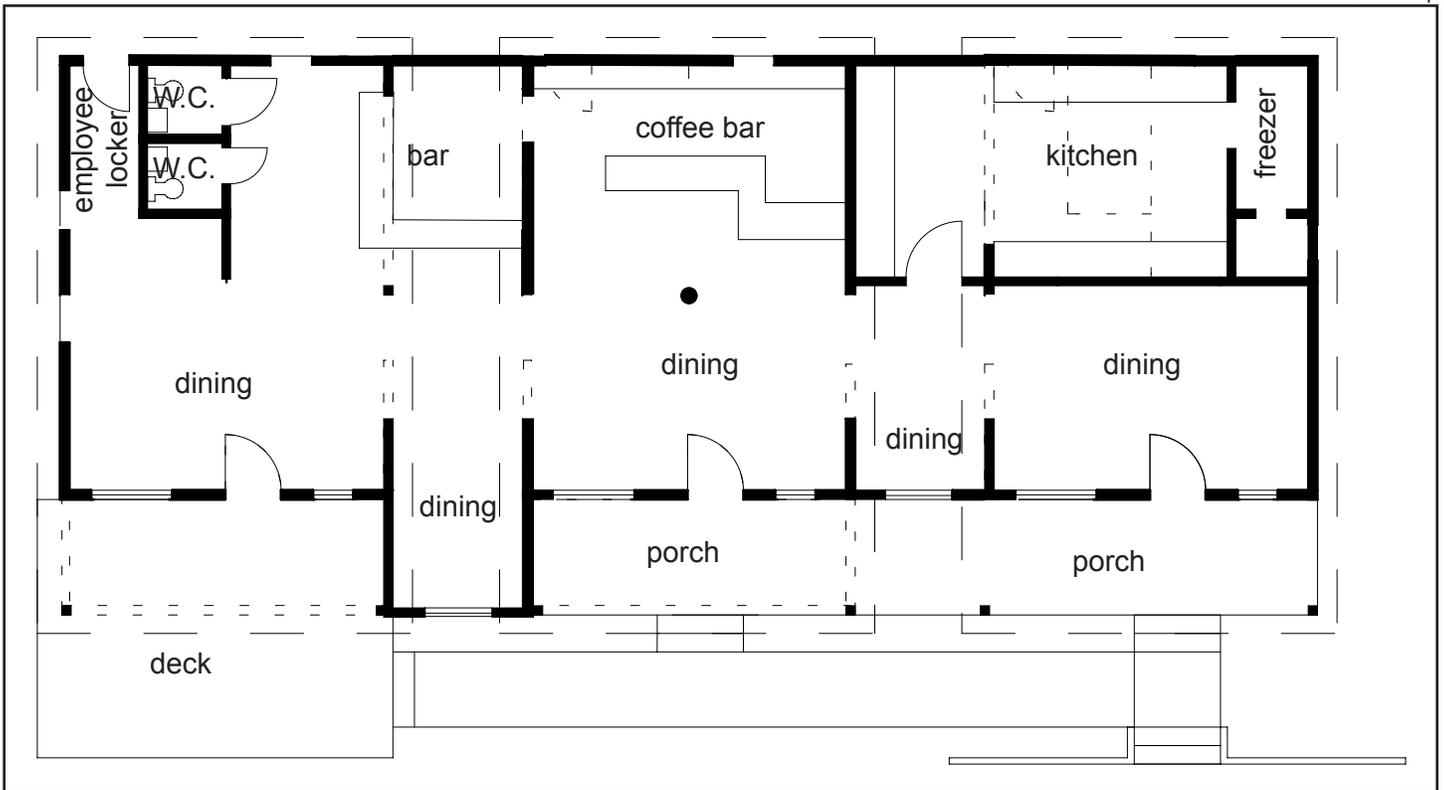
• 1170 Republican Street, sketch plan, Row House Cafe
